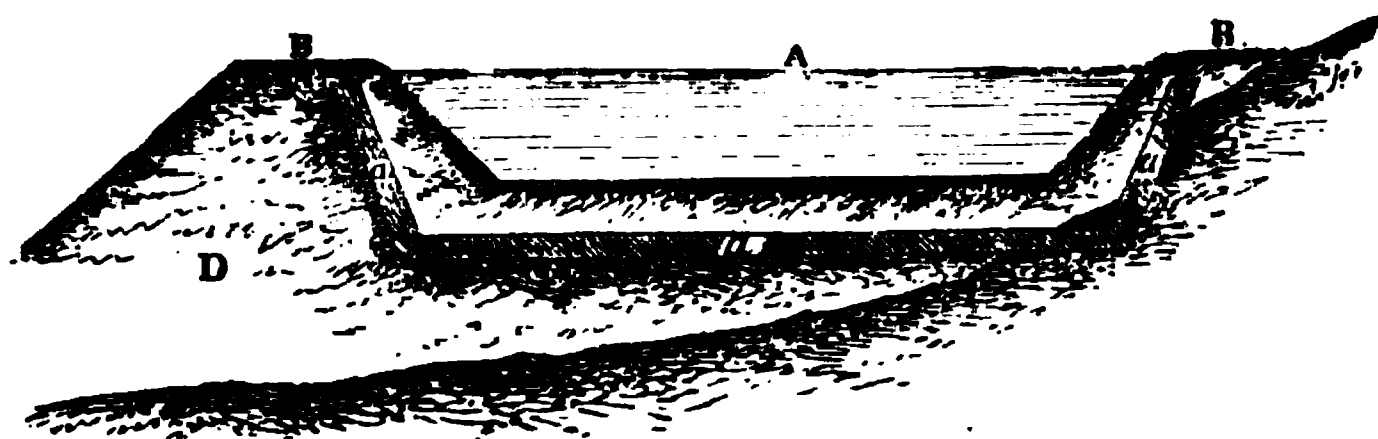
Cross section of a canal in side cutting lined with masonry.
